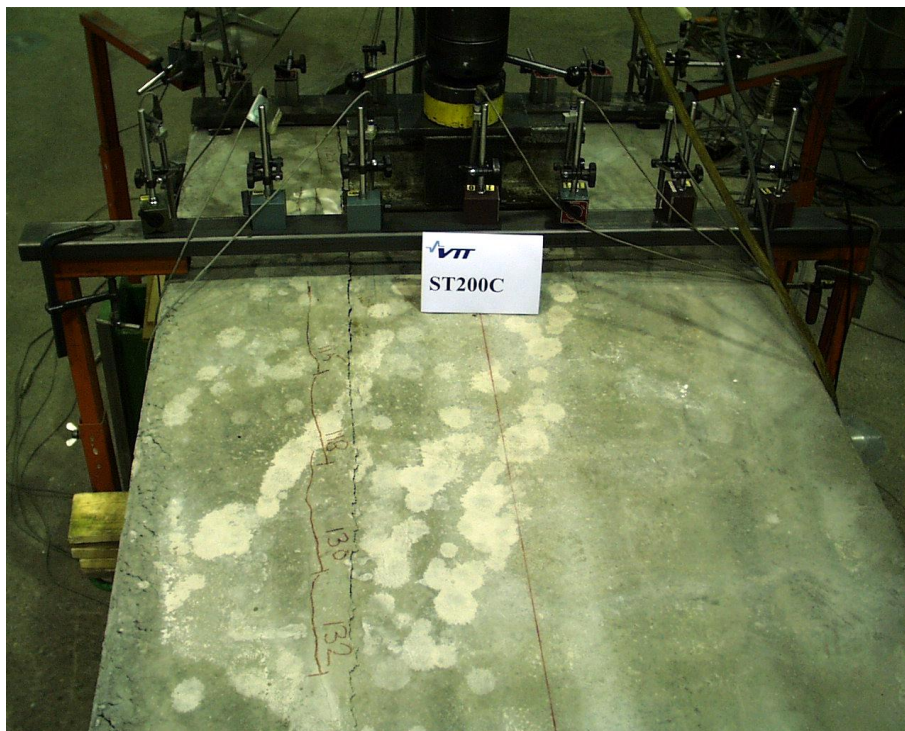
ST200C. Top view. Longitudinal cracks after failure.
